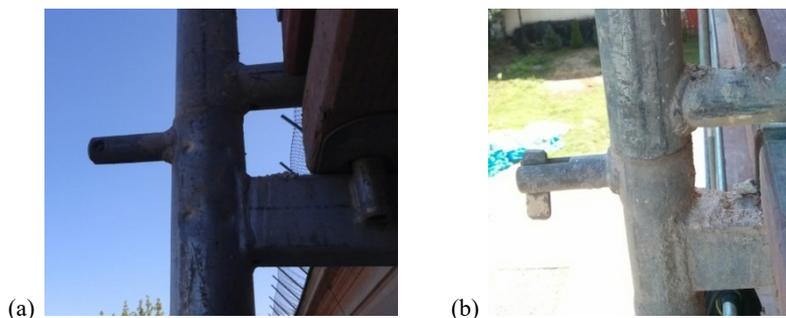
Fixing of a vertical bracing: (a) damaged, (b) complete.
